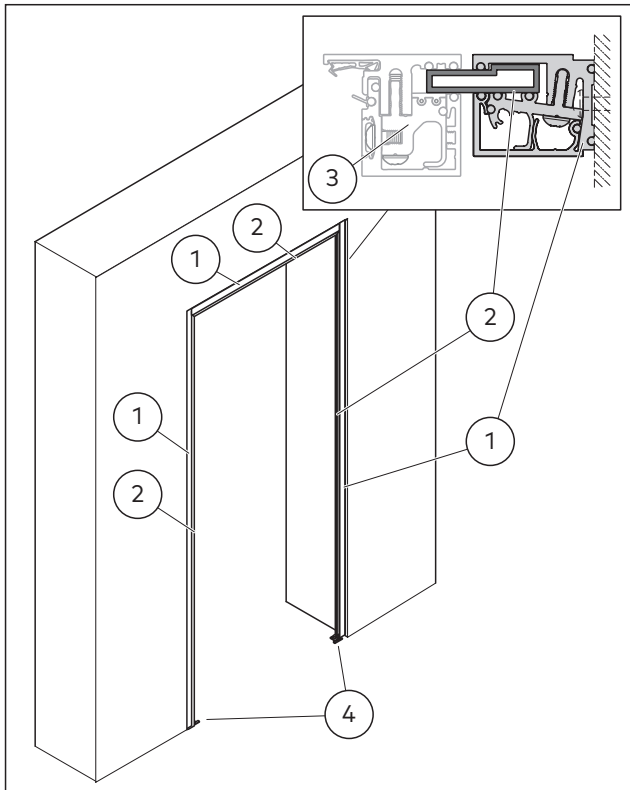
Example of an installation situation with mounting profile and fixed glazing adapter
